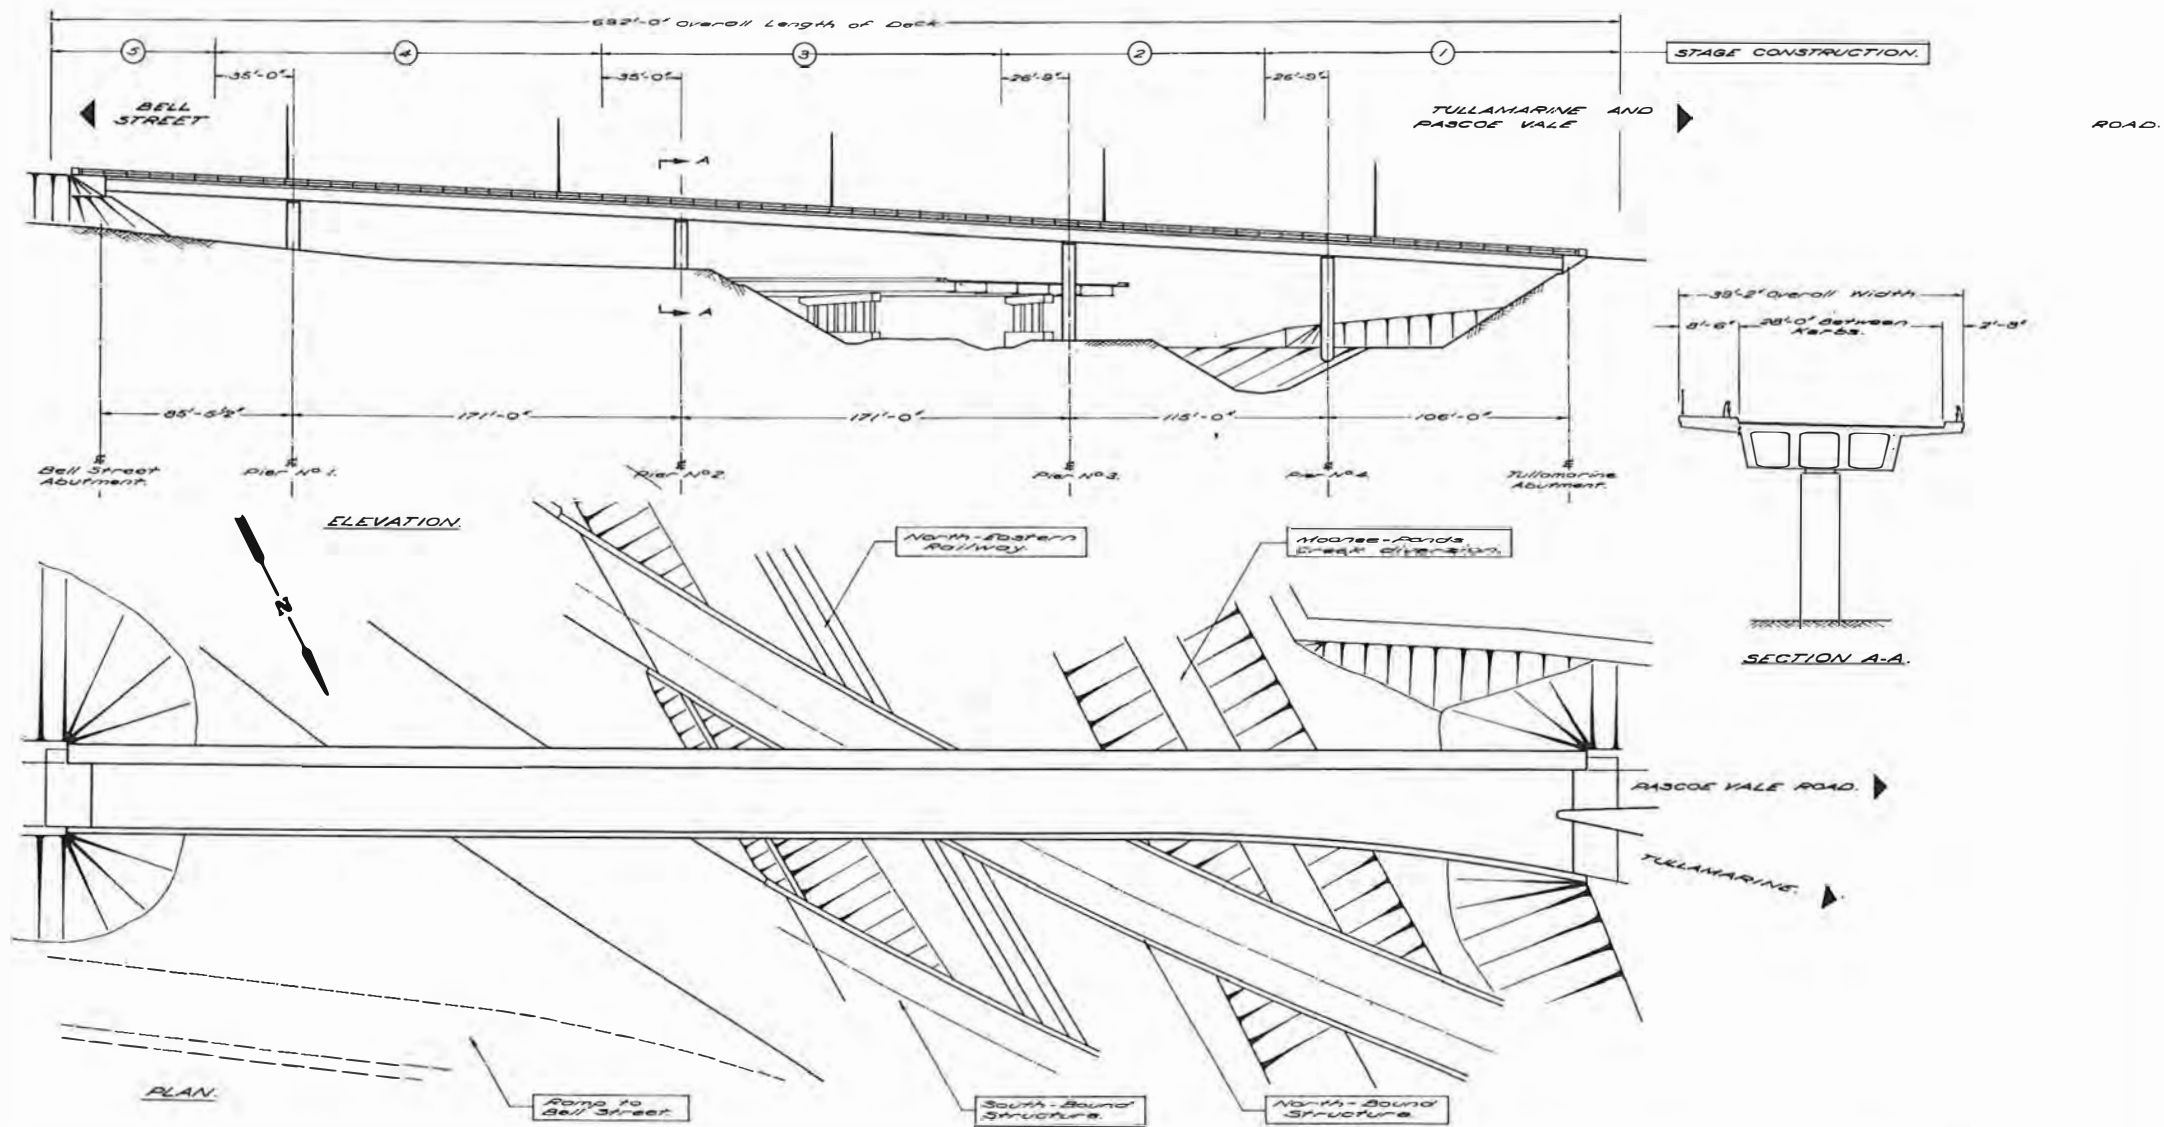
General Arrangement, Bell Street Bridge, Strathmore By-pass Road.
